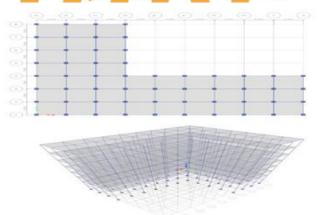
plan and 3D Elevation of L-Shaped Building
